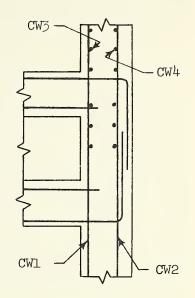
Steel layouts at closed horizontal sections of riser.
